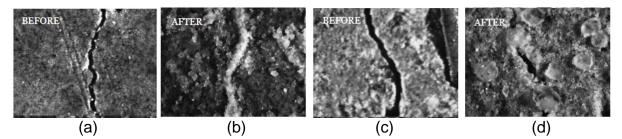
healing of cracks in steel+sisal (a,b) and steel (c,d) HPFRCC specimens-
